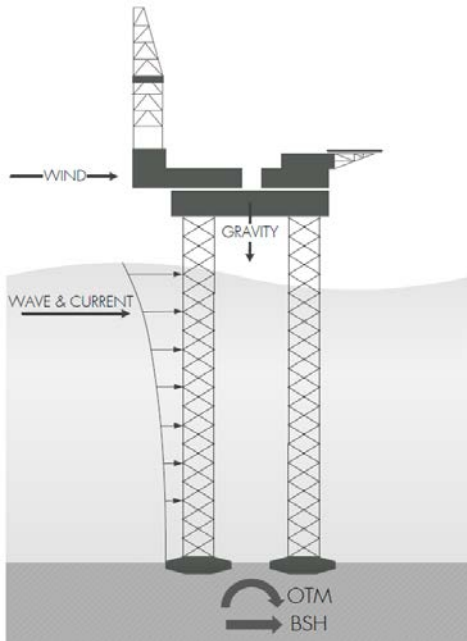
Environmental, gravitational and (resulting) foundation loads for typical jack-up in elevated condition.
